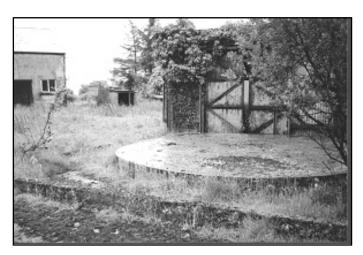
View of circular shaft, capped with concrete in 1988. Behind is the shaft signalling and access shed, and to the left, part of the electrical-mechanical workshop.
